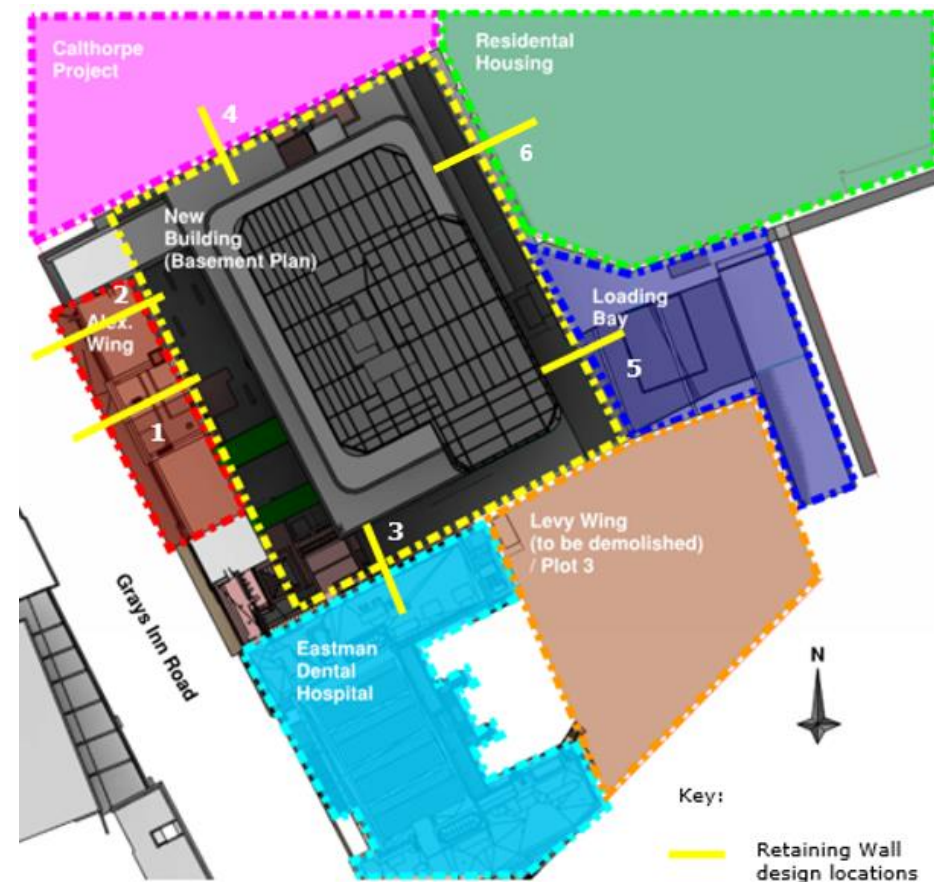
Secant Pile Retaining Wall Sections Analysed in Oasys Frew
